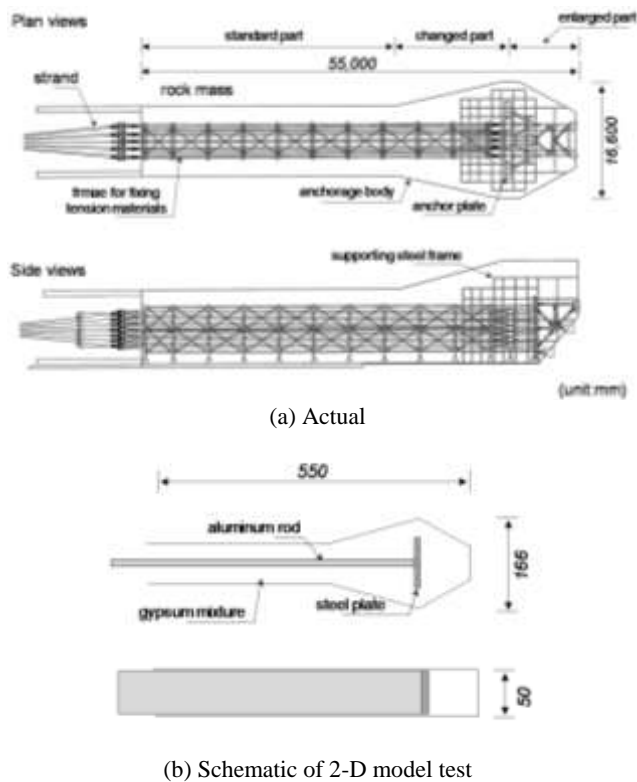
Plan and side views of tunnel-type anchorage body (Yooshin Co., Ltd., 2010)
